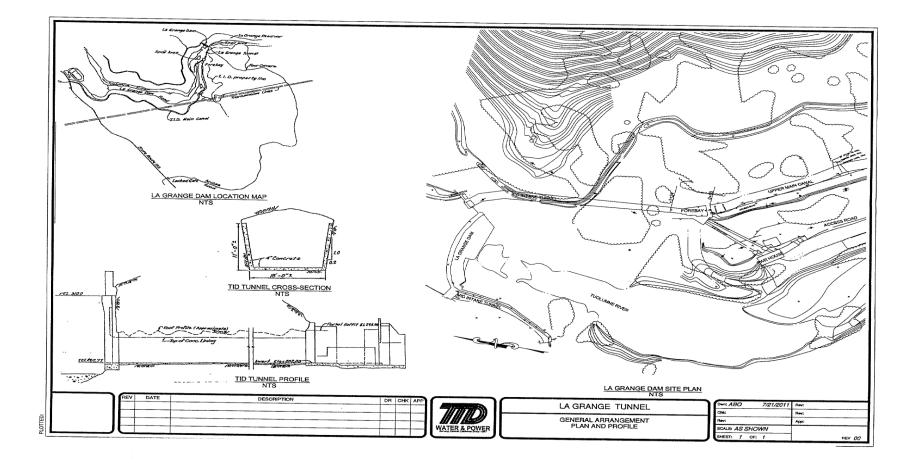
Site plan of La Grange diversion dam and facilities showing diversion dam, TID tunnel intake, tunnel location, penstocks, powerhouse, and TID's Upper Main Canal.
